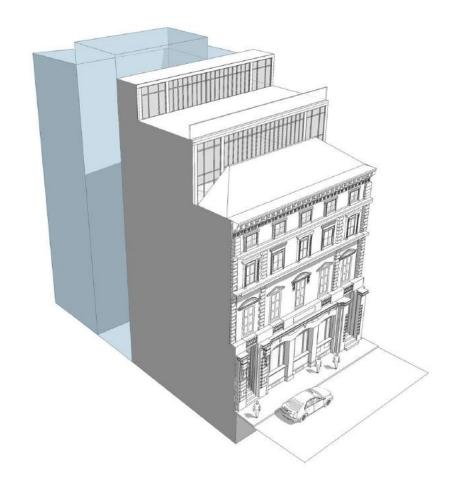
Internal light well created between existing building an new extension, maximising daylight into deep-plan building.
